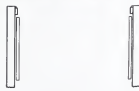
Floor plan showing position of doors wide open, equipped with "SlydaSyde" DD hardware.
